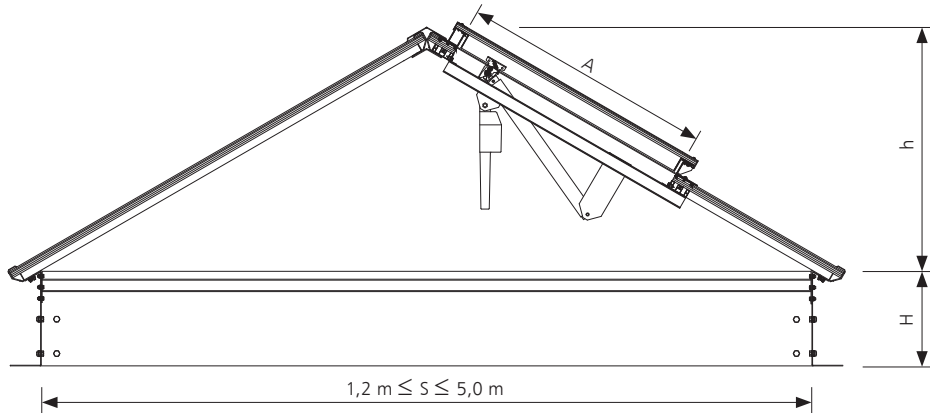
Cross section C-C of mcr PROLIGHT triangular shaped continuous rooflight with daily ventilation single-leaf vent
